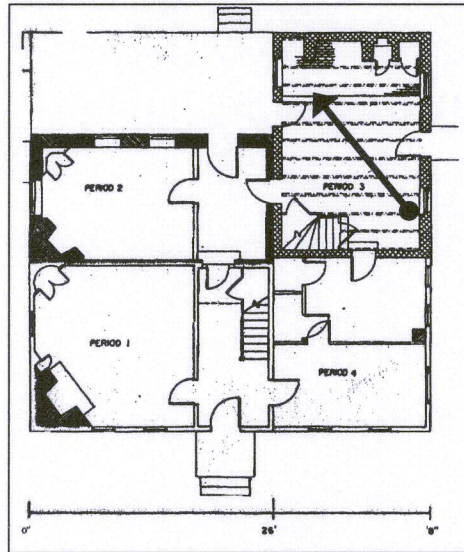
Period 3, first floor, west corner. Note hearth, exposed ceiling joists, and closet containing stove flue.
